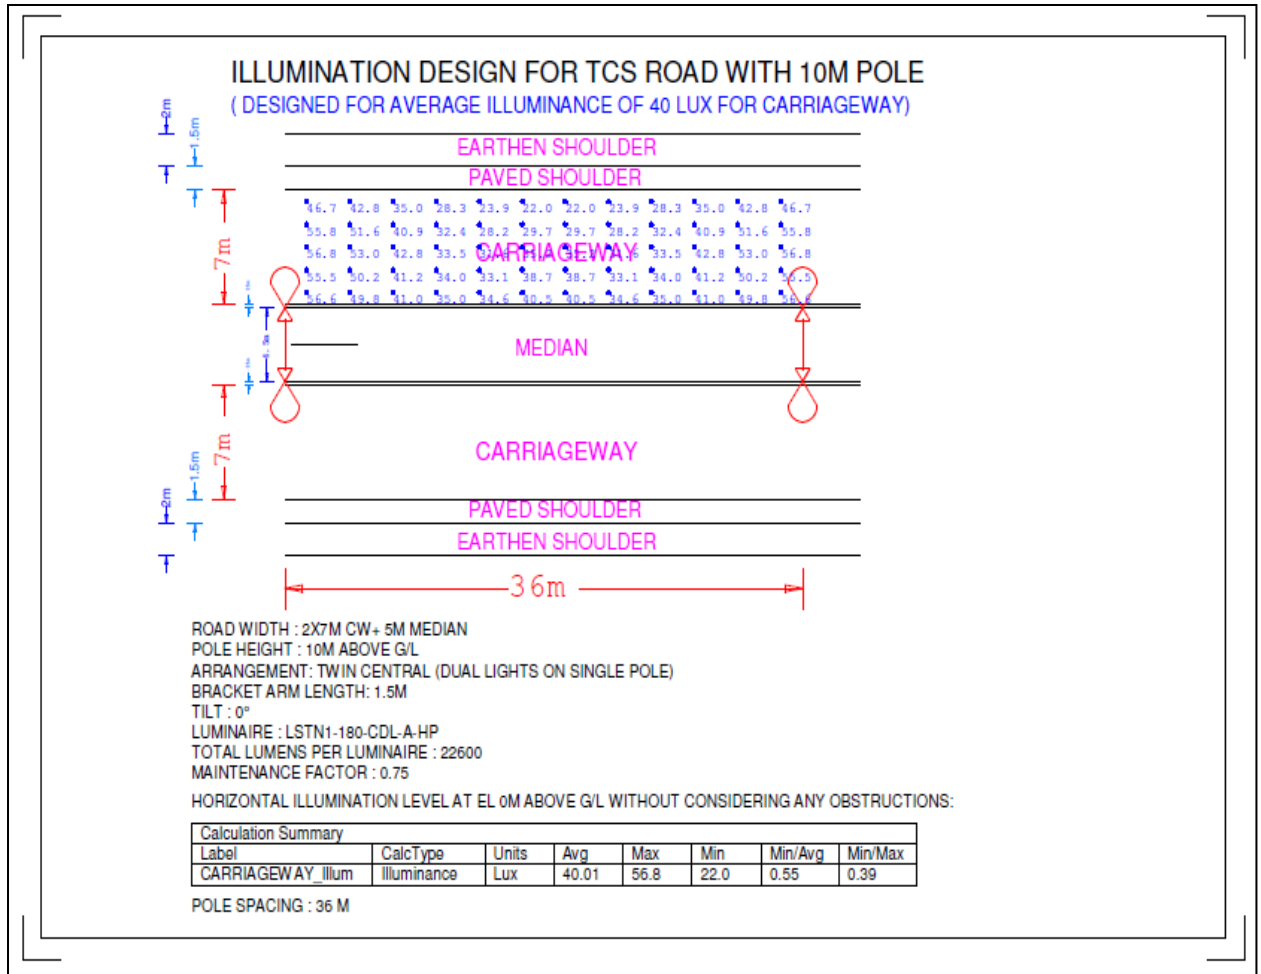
26M wide Roadway Lighting Design with LED Luminaire.
